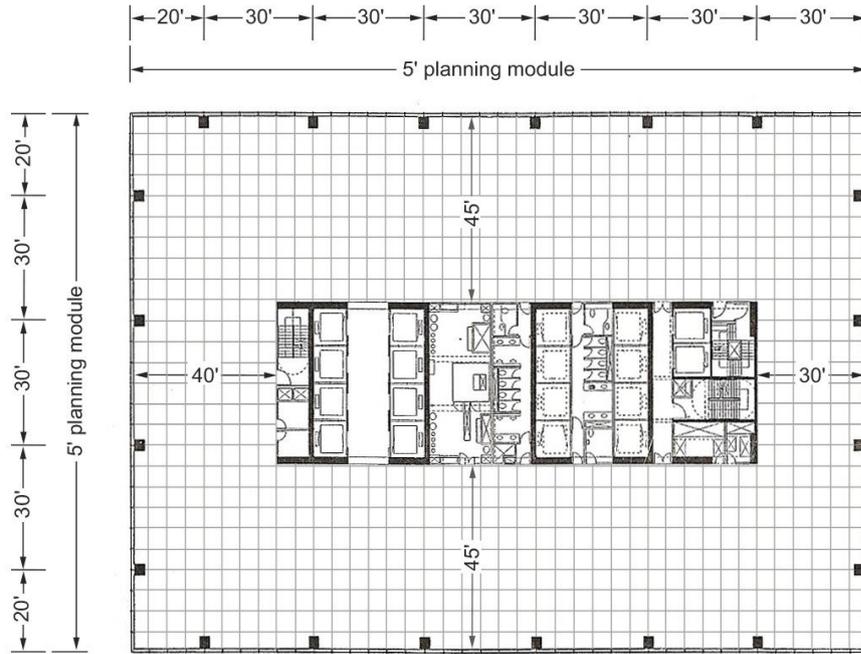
Lease span measurements, structural bays, and planning modules illustrated on a typical floor plan. (Kohn&Katz, 2002, 34).
